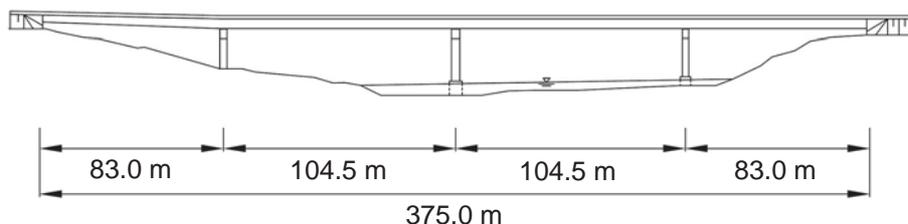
Elevation of the Inn river bridge Wasserburg, Germany, 1987.
